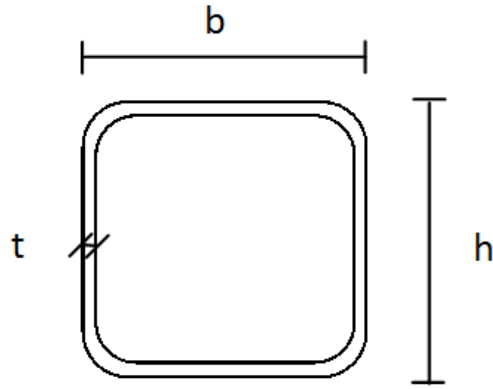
Cross section of the hollow rectangular beams in Table B.2
